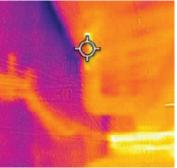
&4 – Interior ceiling plenum at exterior wall, Staff Break Room. The CMU to gyp is sealed but IR shows significant thermal leakage where the concrete meets the roof. Rain leader shows a warm penetration spot but this is likely due to heat trace being on.
